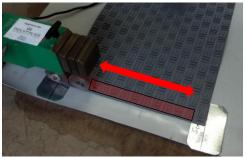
First weld the cross seams of the plates with the automatic machine. The intermediate sheets leave an unwelded
